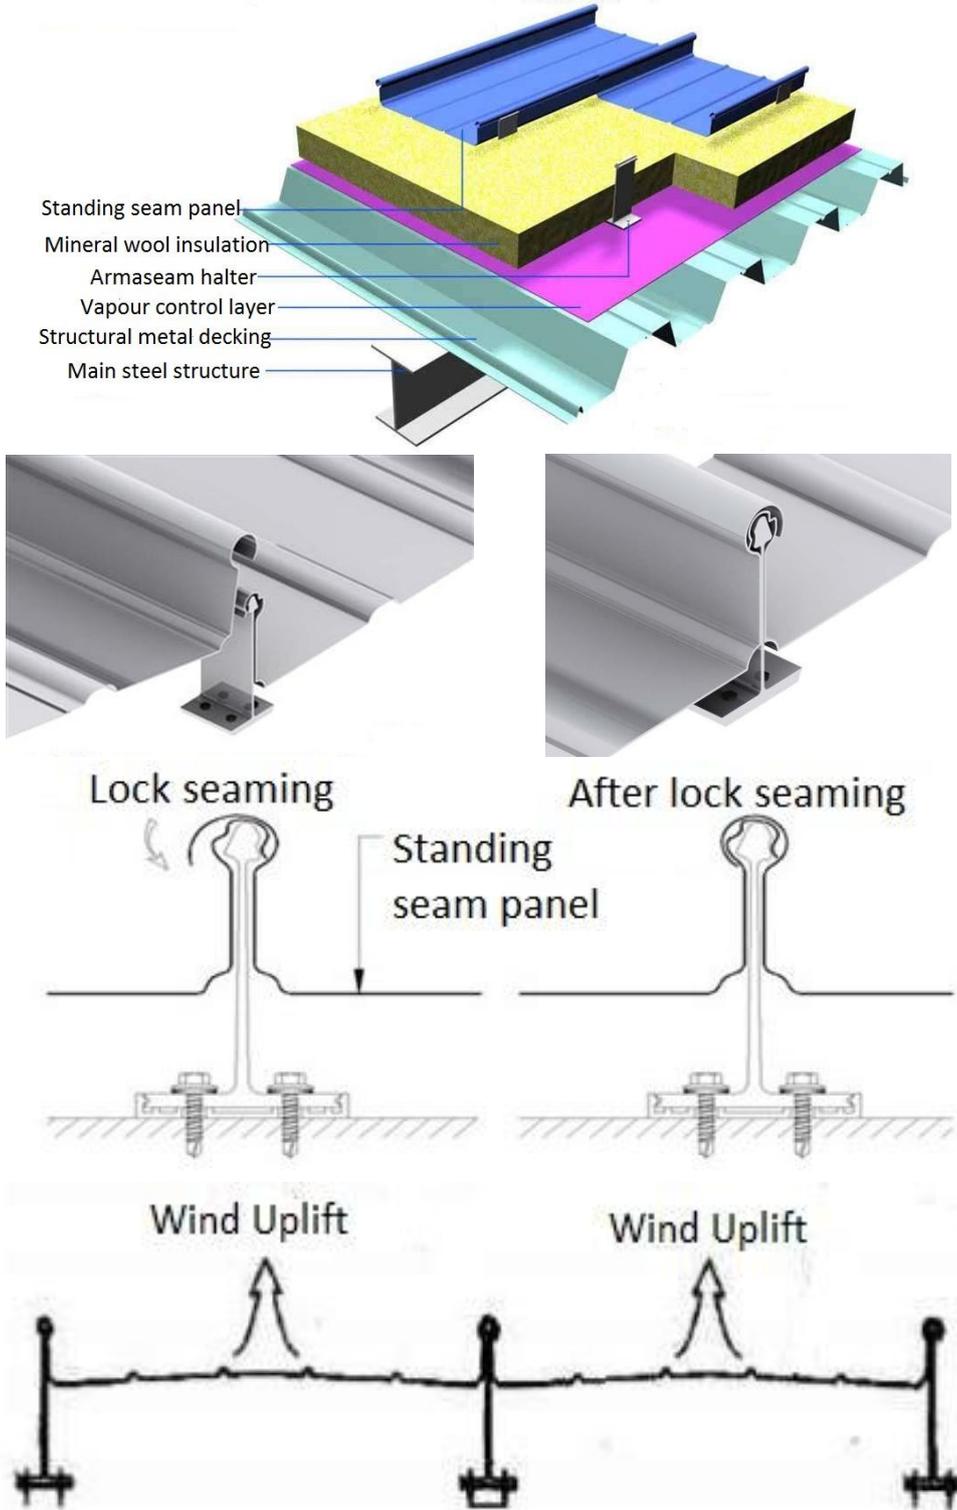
Case 1 of Detailed Wind Prood Joints Design
